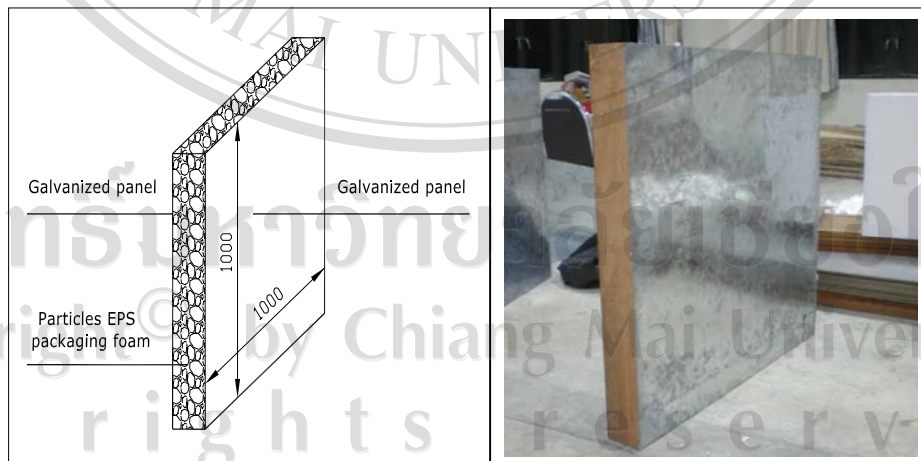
Wall panel to be used as the partition between heating and metering cells
